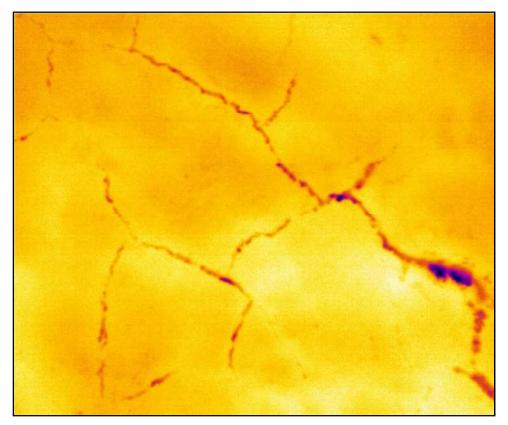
Example of shotcrete with cracking and efflorescence
